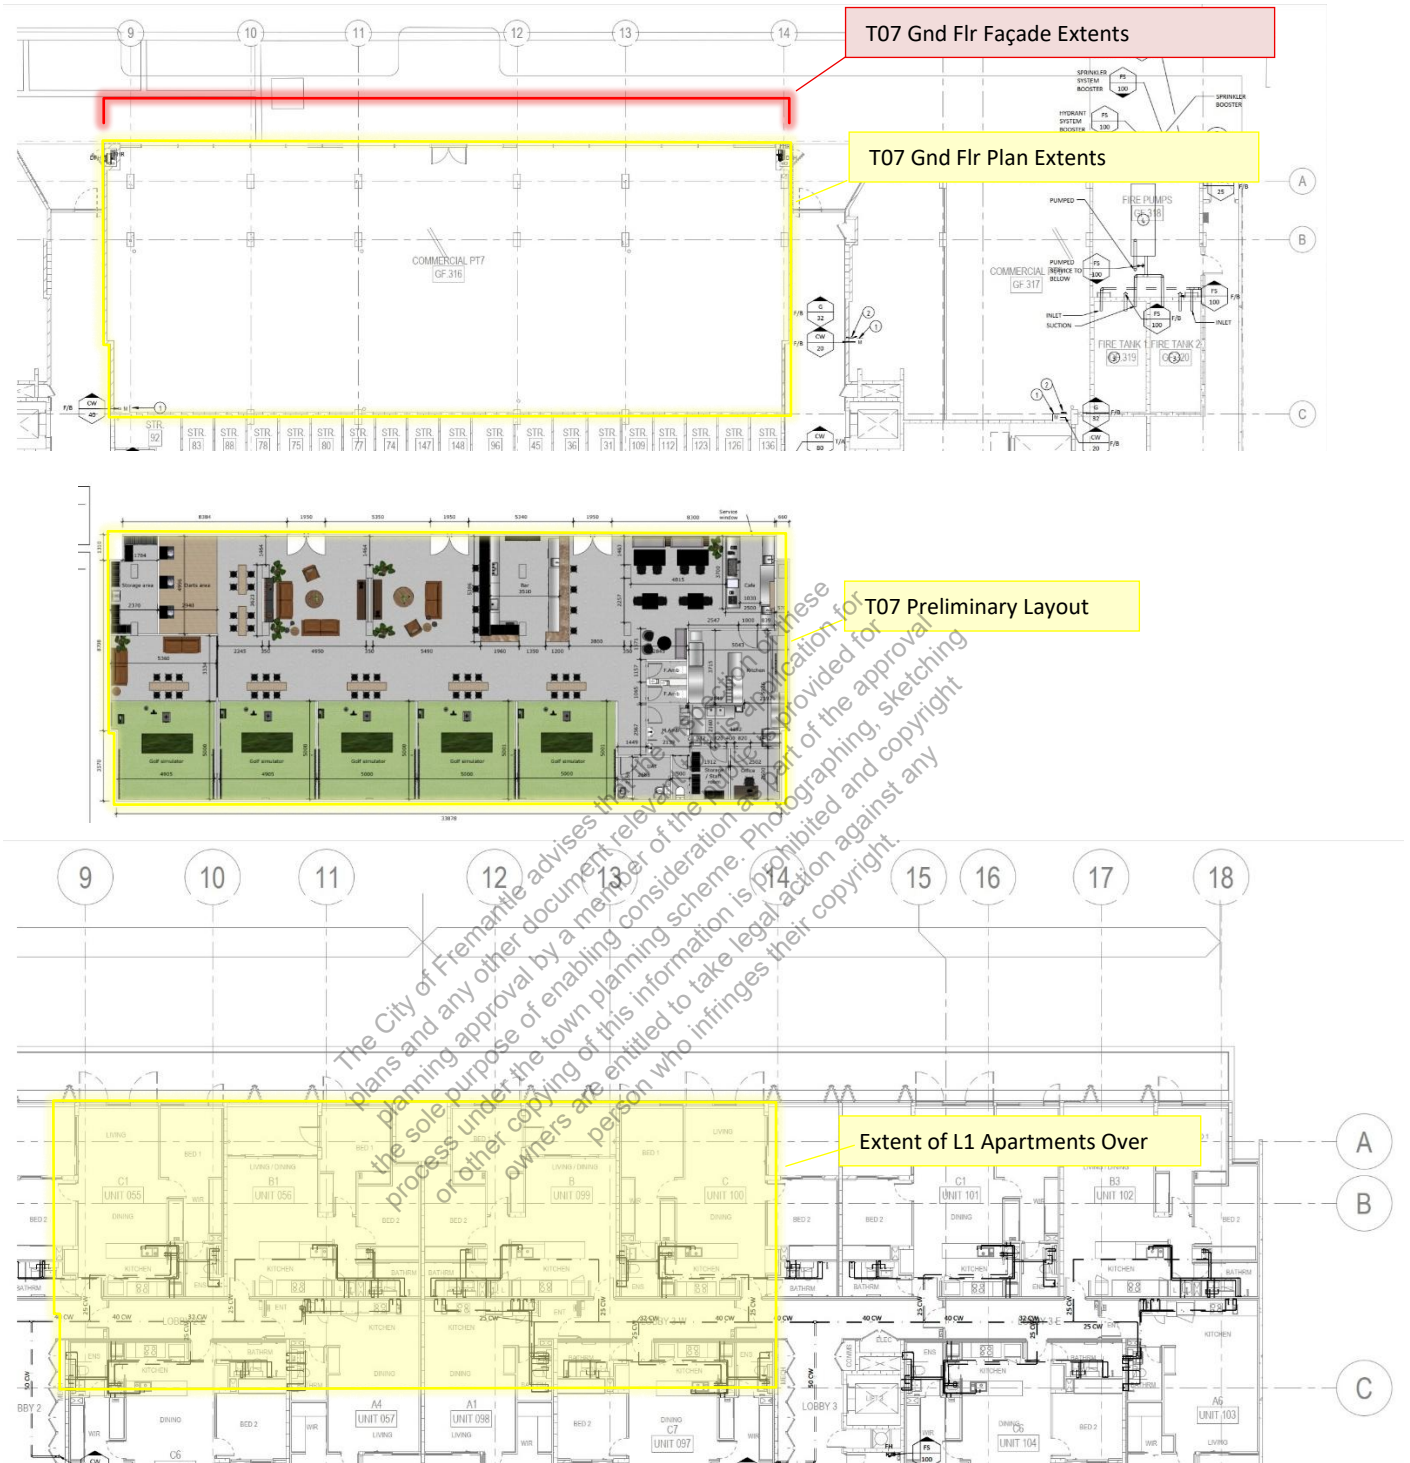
T07 Floor Plan (Upper); Proposed Layout (Middle) and Extent of Apartments Over (Lower)
